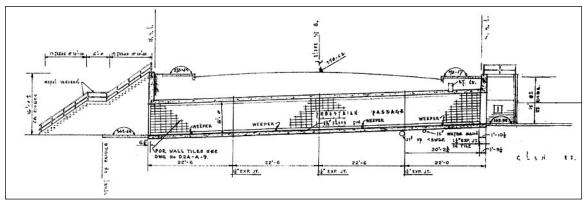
A longitudinal section depicts the pedestrian tunnel or passage under Bloor Street with stairways at either end [TTC, 1962].
